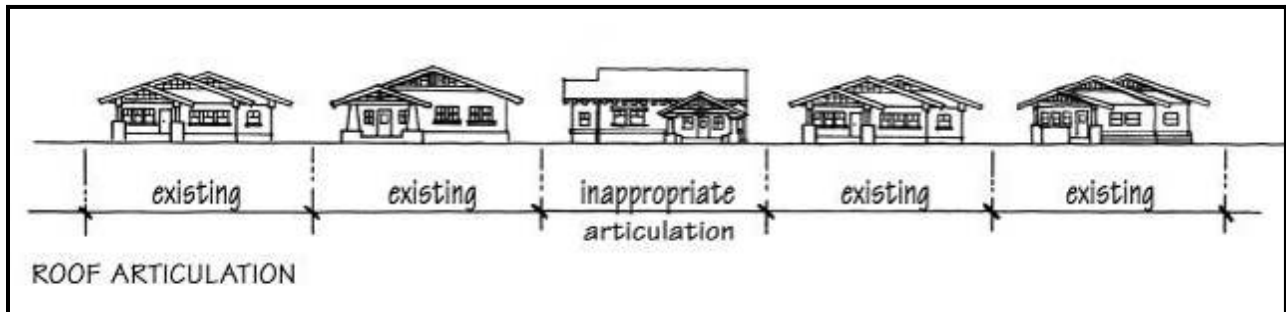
Roof design should be compatible with the existing neighborhood character
